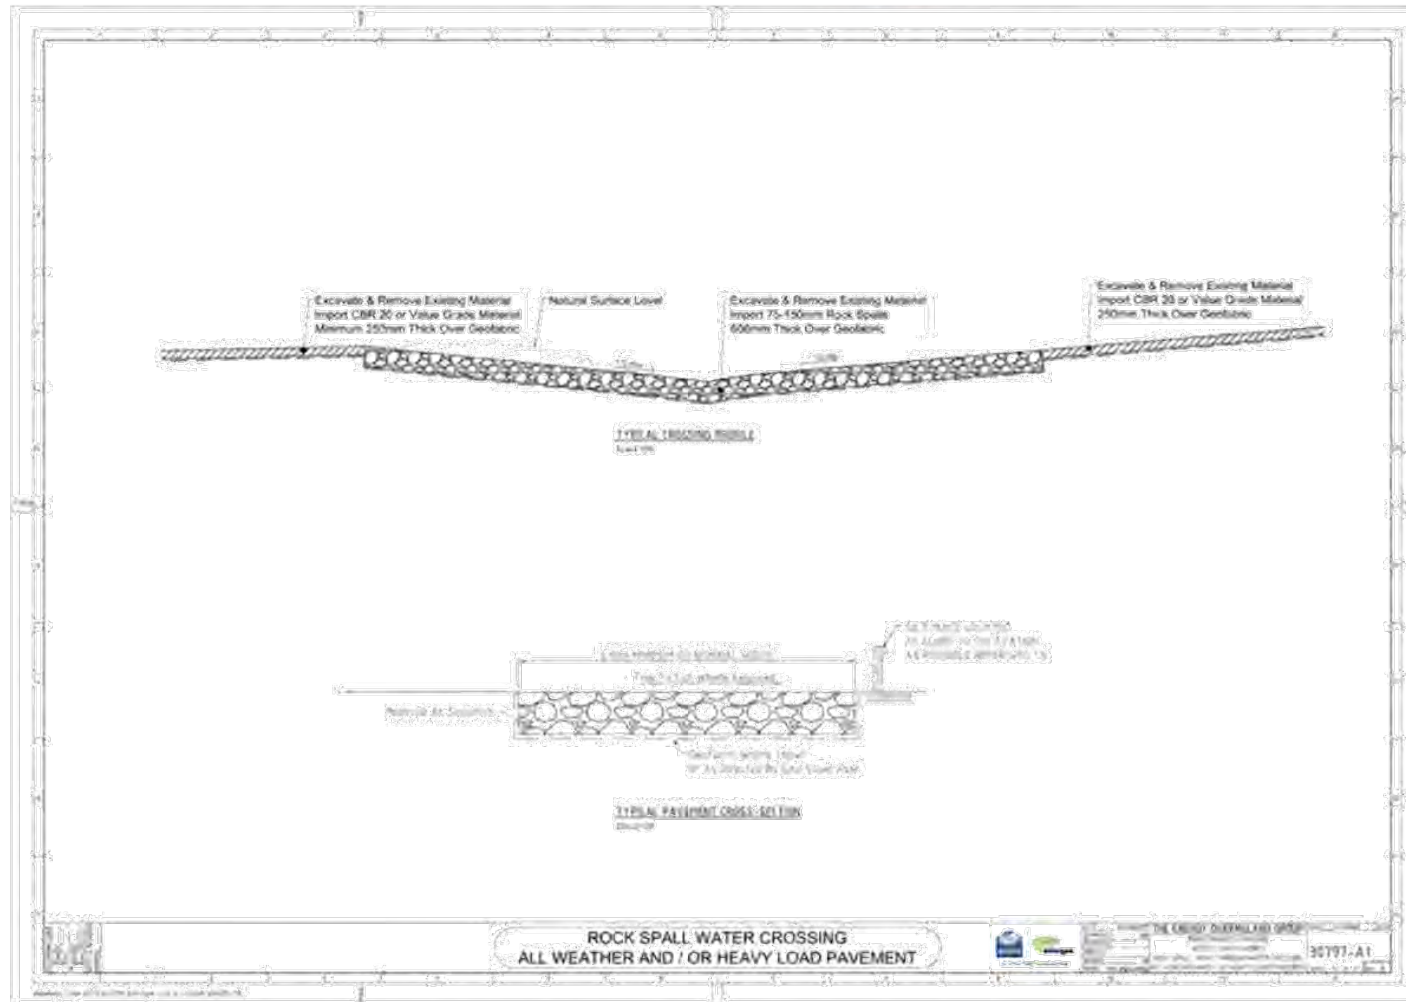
Access Track Infrastructure – Minor Creek Crossing – Rock Spall Water Course Crossing
